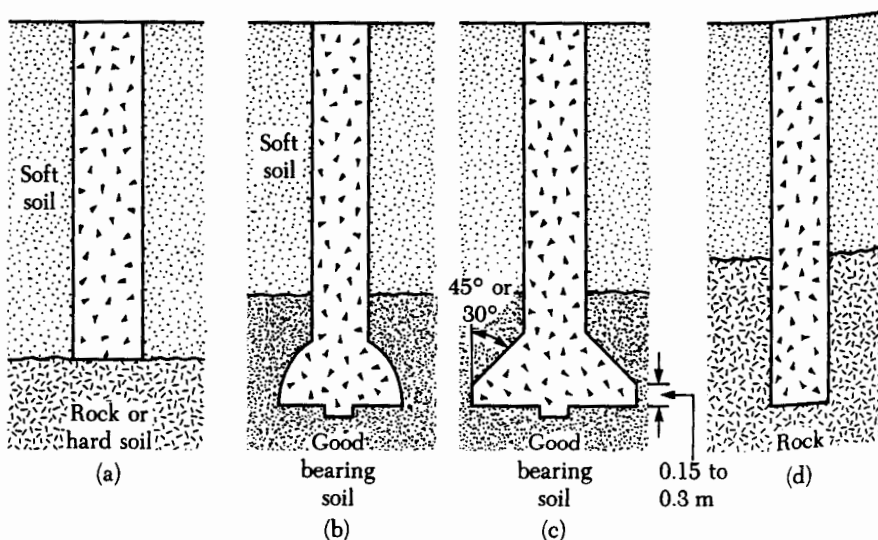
Types of drilled shaft: (a) straight shaft; (b) and (c) belled shaft; (d) straight-shaft socketed into rock
